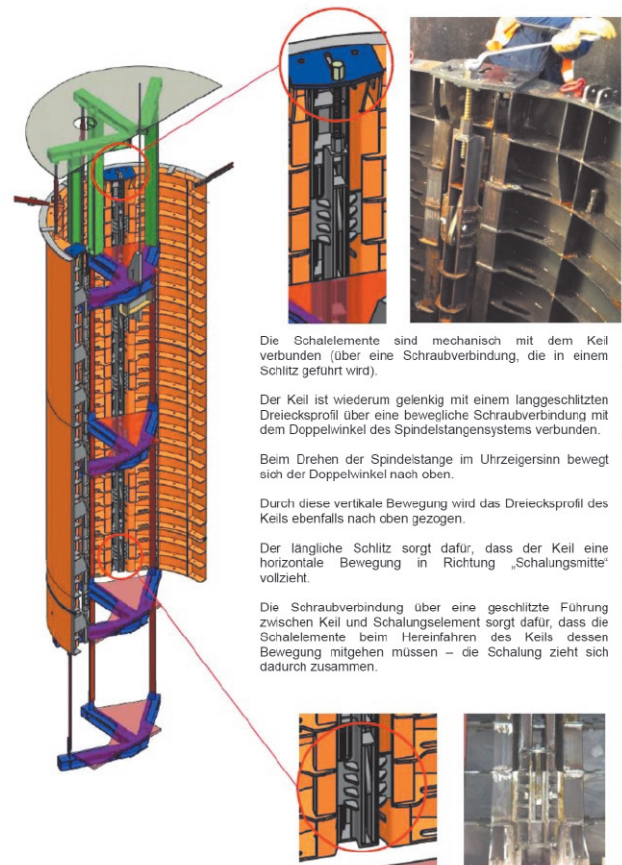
Layout drawing of the climbing formwork concreting system.
